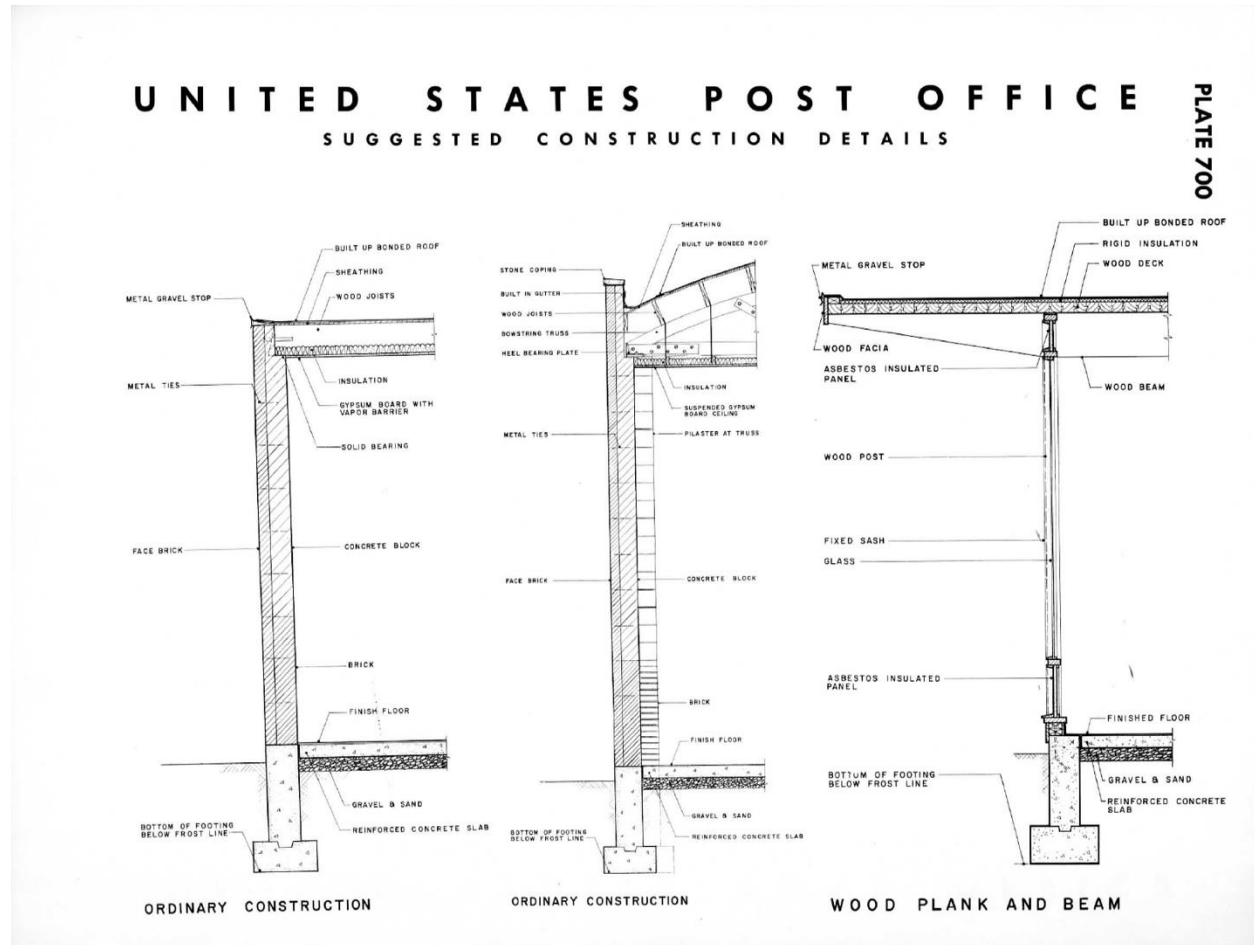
Suggested Construction Details from *Building Designs, 1959*, detailing three different construction methods (Haylee Rose, 2025).
